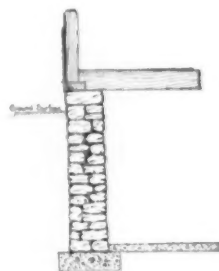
Typical dwelling house foundation. A wall of rubble masonry.
